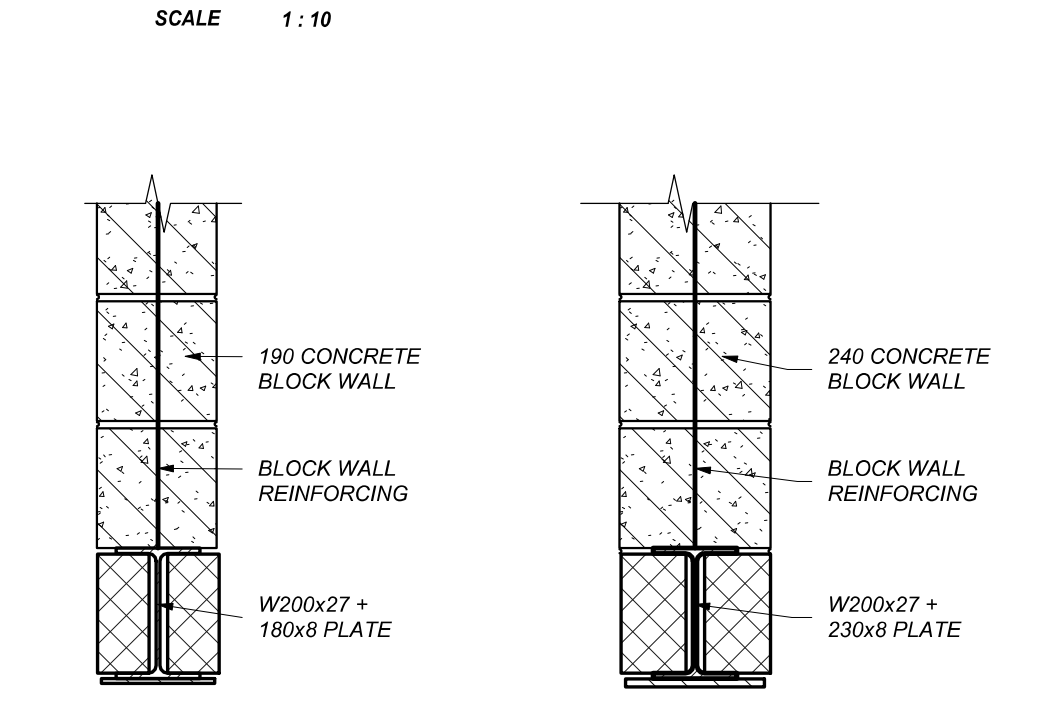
DETAIL OF ANCHORAGE OF STEEL COLUMN TO MASONRY WALL
